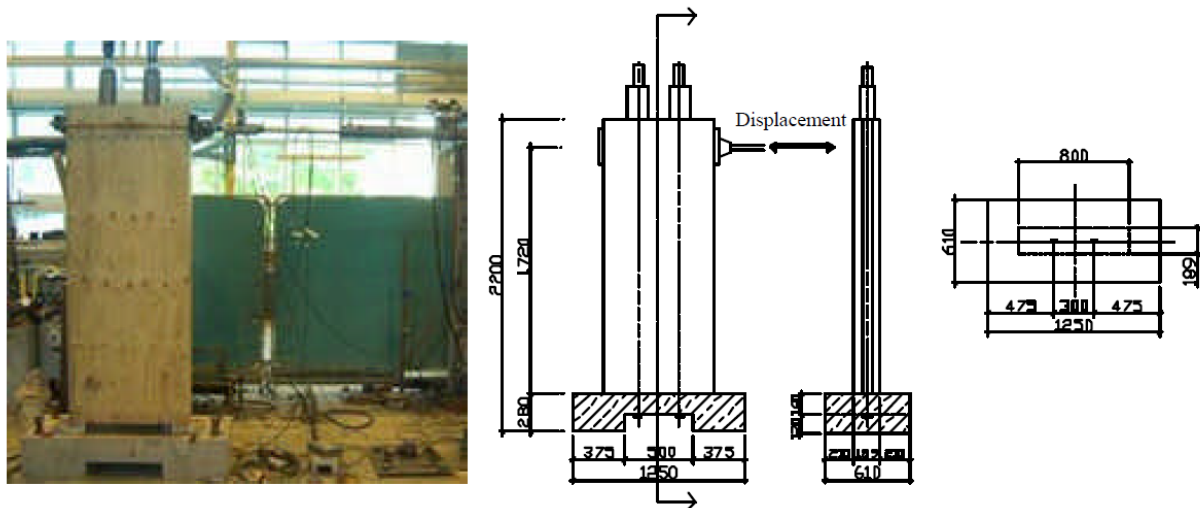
Test setup and geometry details for quasi-static cyclic tests on wall-to-foundation connections [Palermo et al., 2006]
